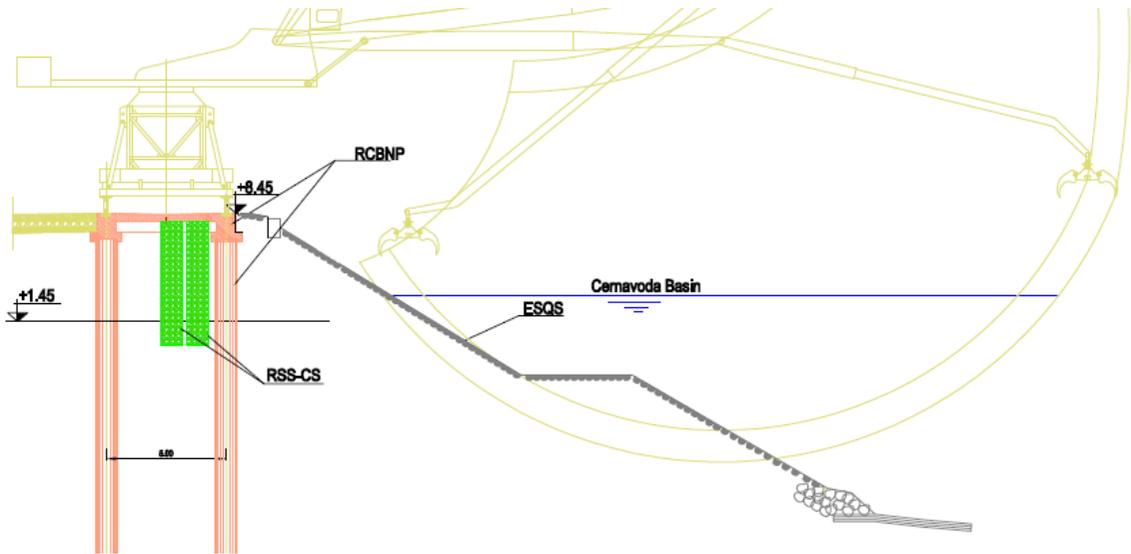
Existing quay structure (ESQS) and new proposed structures (RCBNP) and (RSS-CS).
